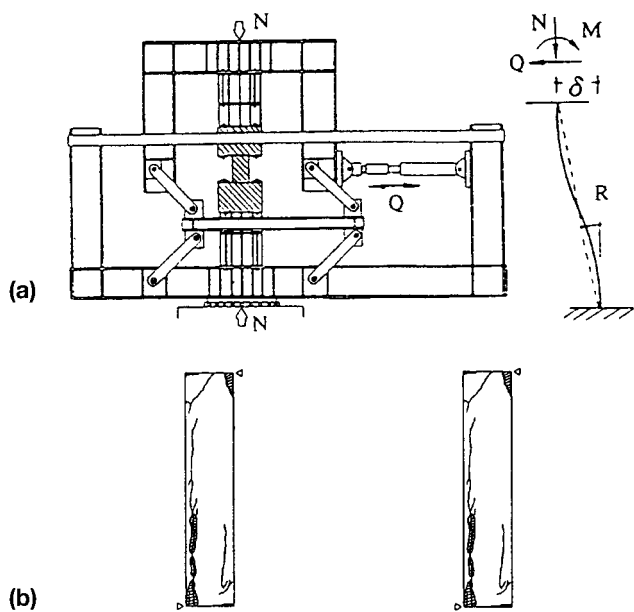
Physical Test Conducted by Zhang et al. (1993): (a) Test Setup and Loading System; (b) Typical Crack Pattern and Failure Mode of Specimens
